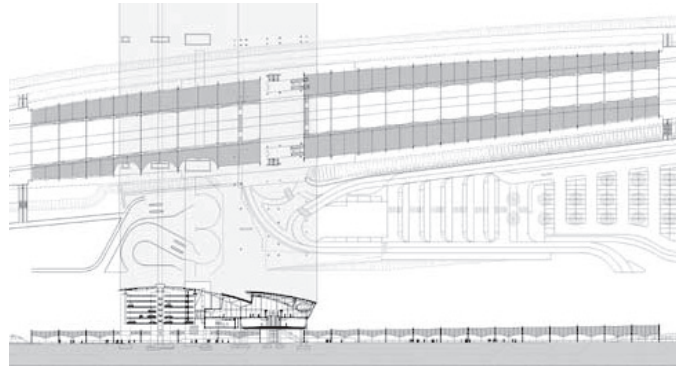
Leipzig/Halle Airport Railway Station, *source: http://www.ap-brunnert.de/dna/5148_ice%20bahnhof%20leipzig-halle.html
